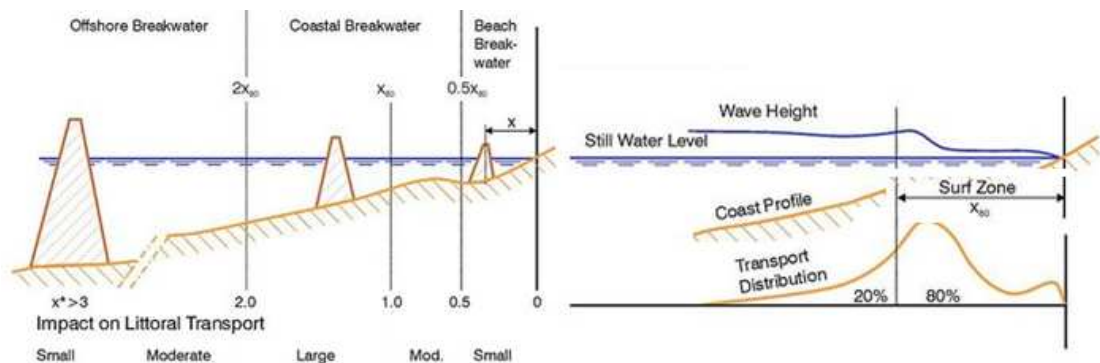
PLACEMENT OF BREAKWATER AND SEDIMENT TRANSPORT
